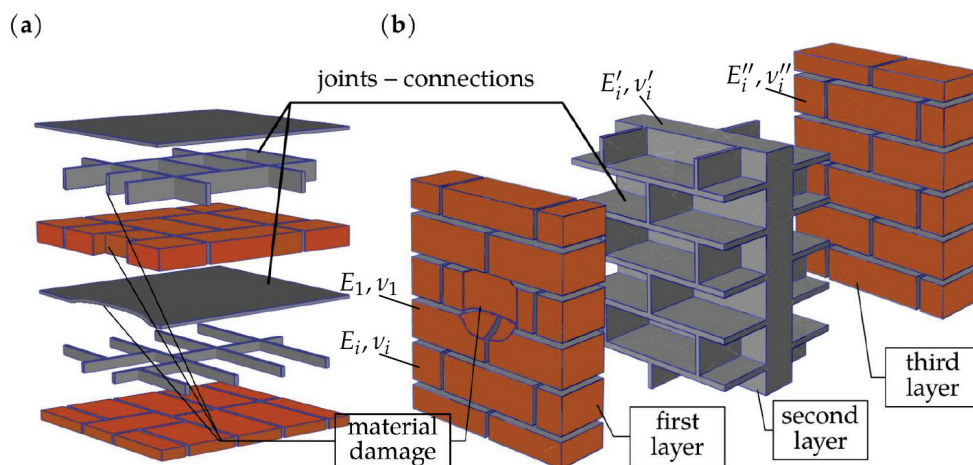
Integration sub-spaces of macro-element with damage: (a) repetitive layers (courses) of solid masonry; (b) multi-leaf masonry.
